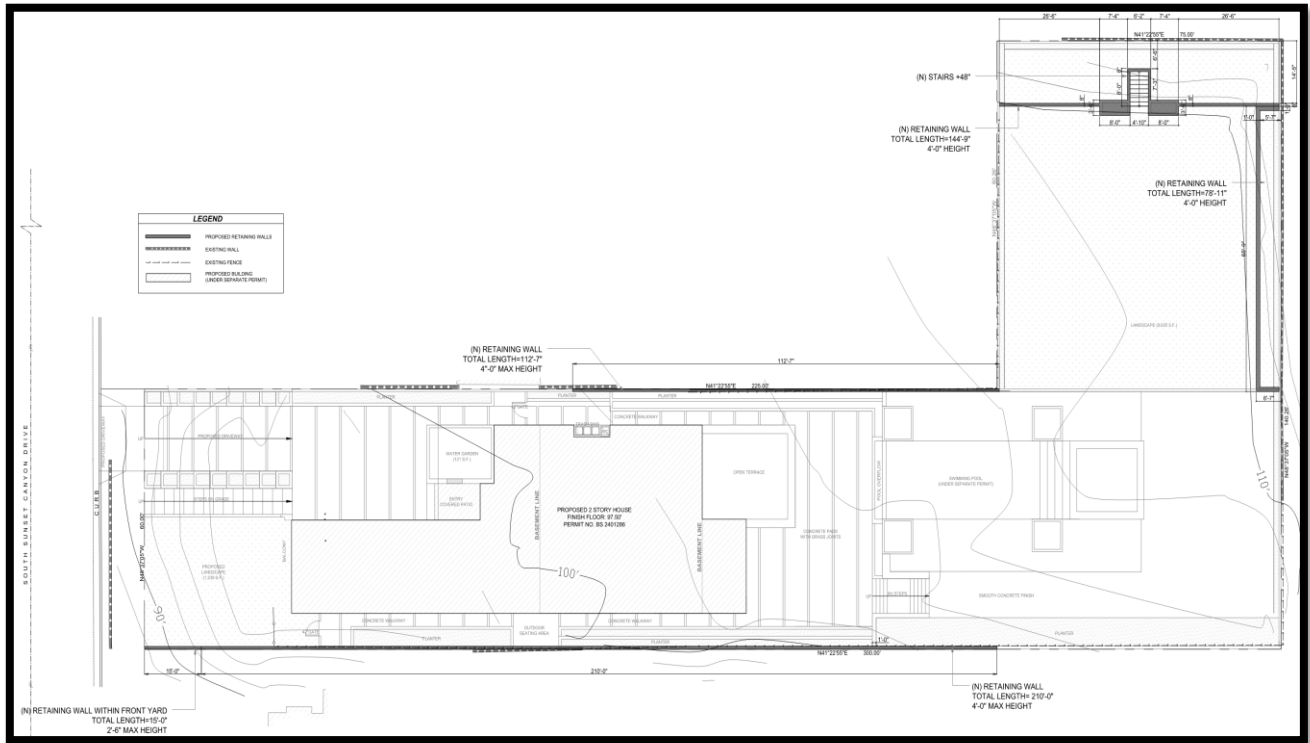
Site plan of the proposed Project, which includes the new retaining walls ranging in height of 2'-6" to 4'-0".
